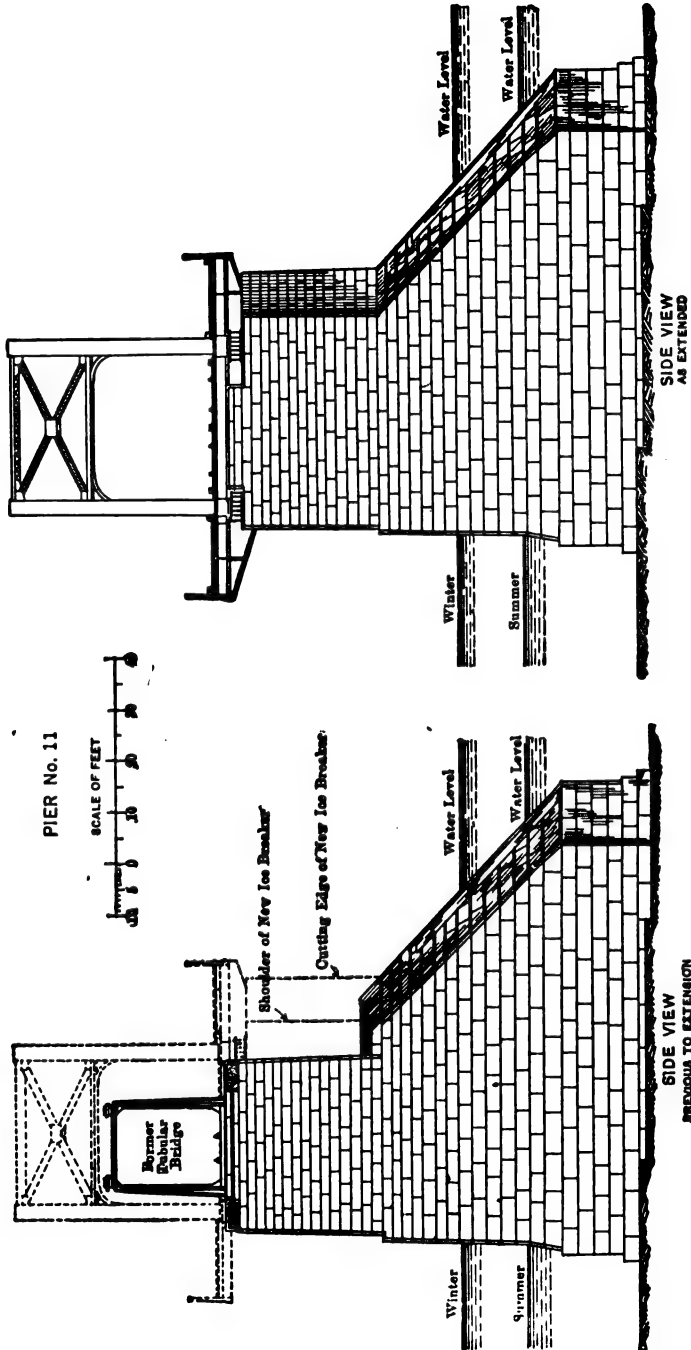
PIERS OF VICTORIA JUBILEE BRIDGE, MONTREAL.
